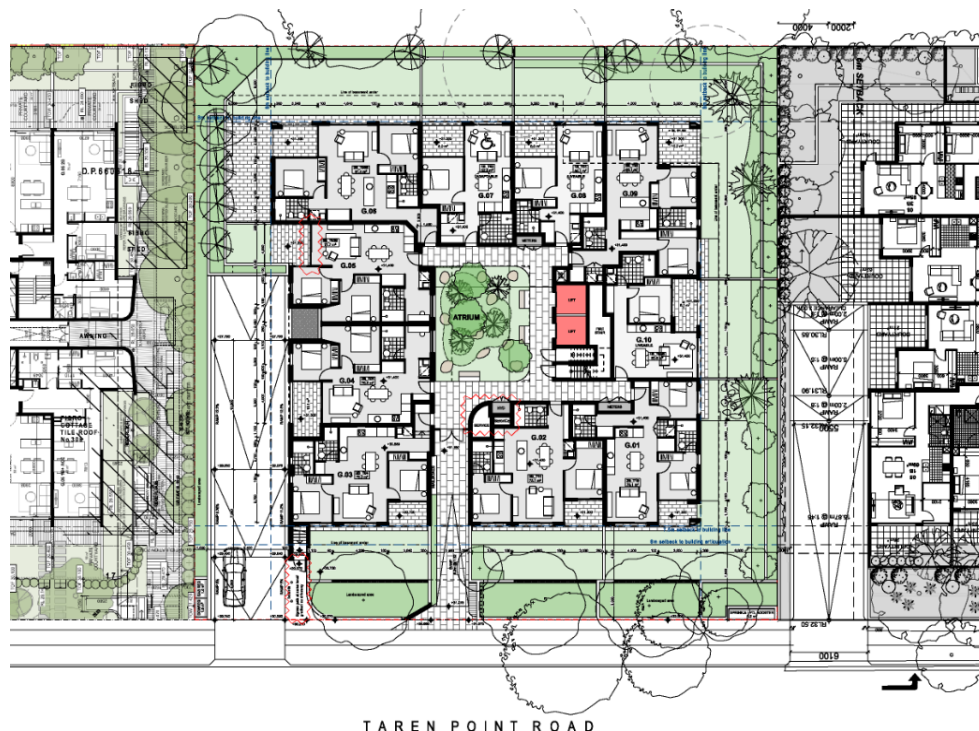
Ground Floor Plan (with the recently approved development at 306-308 superimposed)
